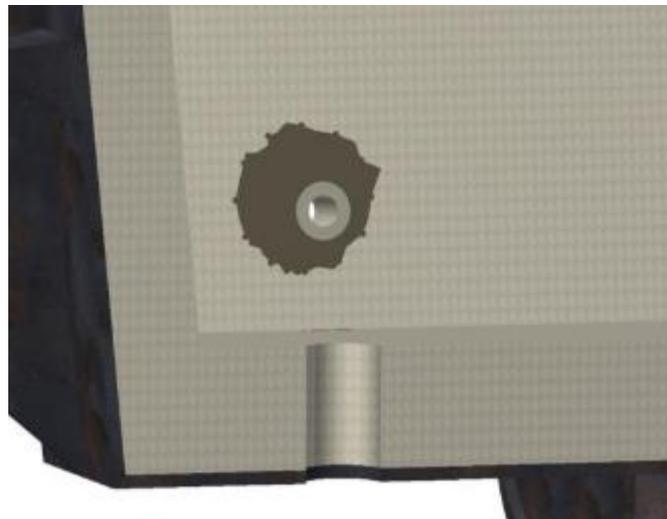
Shows the CasTemp block fixed in place with the embedding tool removed.
